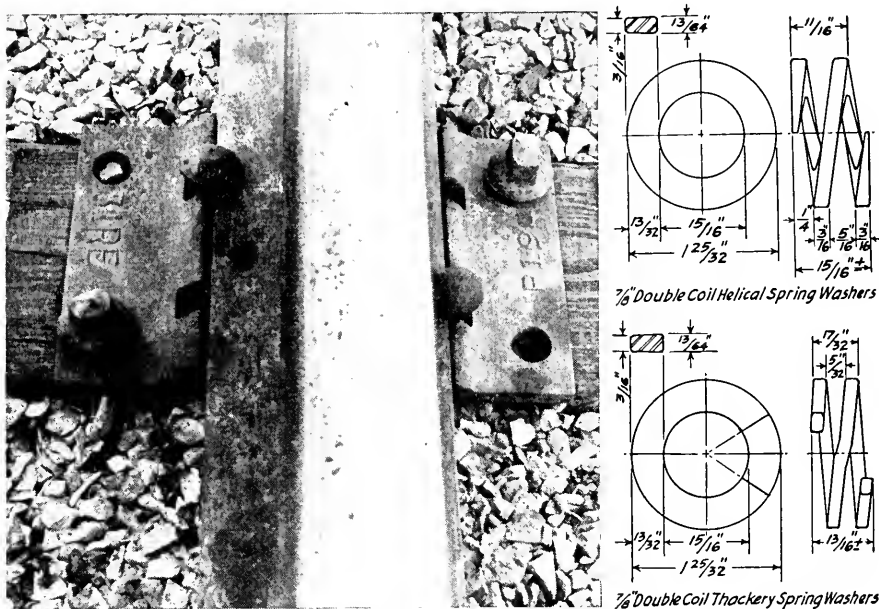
Section 16, 2 1/8 in. by 6 1/2 in. Screw Spikes with Double Coil Spring Washers as Shown.
